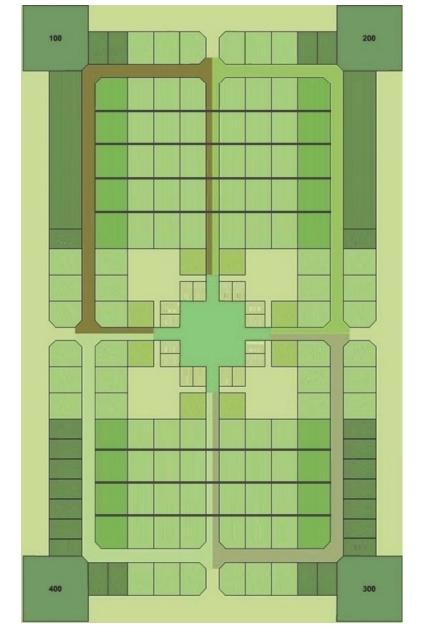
Shopping Mall Typical Floor Layout. Building I and II.
